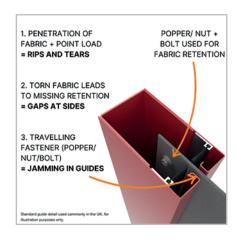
Cross-section through a fire curtain side guide channel showing the traditional method of fabric retention using a bolt or popper. Also shown are the polypropylene filament cold smoke seals traditionally used for smoke control.
